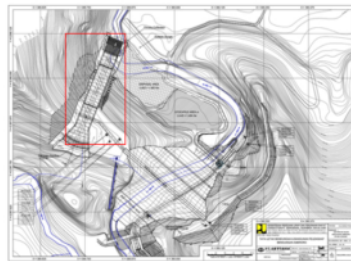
Dam Layout & Auxiliary Buildings of Ameroro Dam
